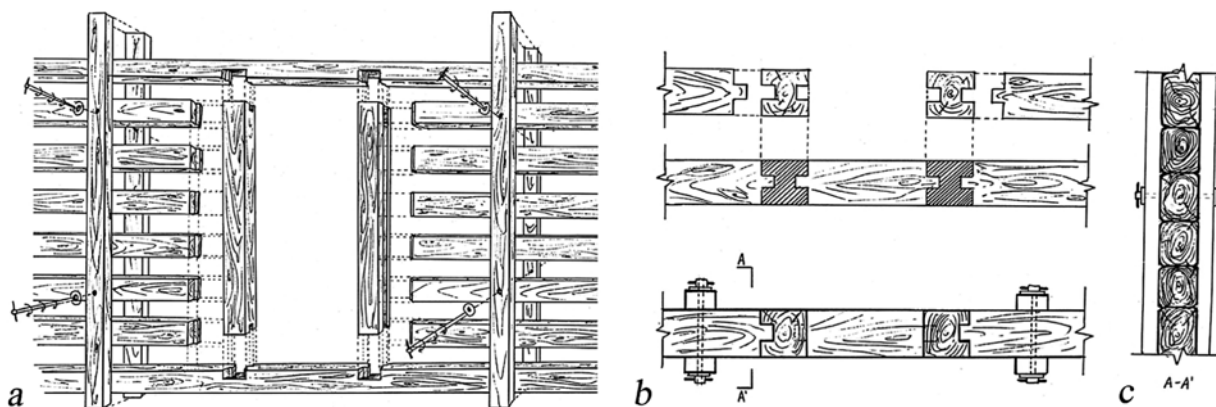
Secondary structure composed of pillars placed on the internal and external walls of the church, in order to reinforce and stiffen the perimeter walls (designed by L. Berežanskytė)
